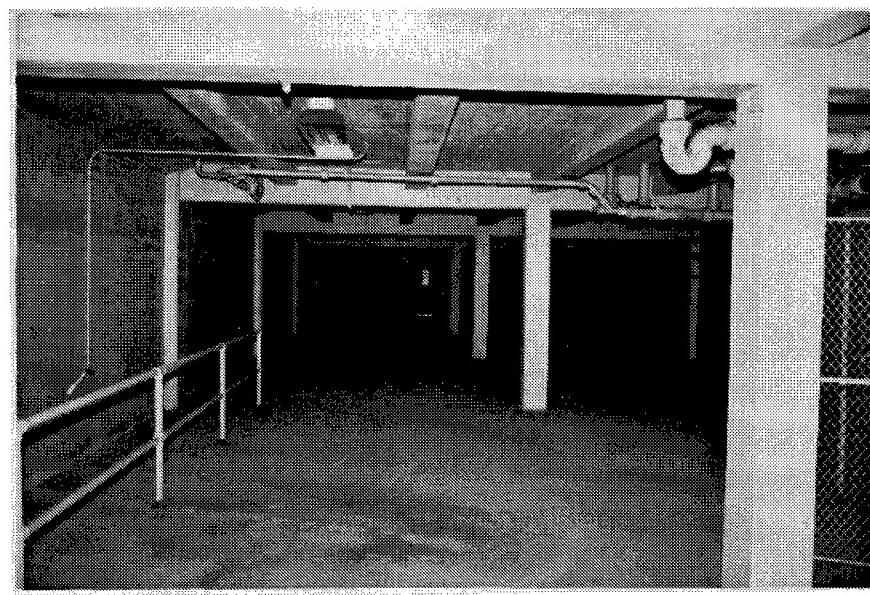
Building CA-15: Interior view of the first floor of this Change House.
